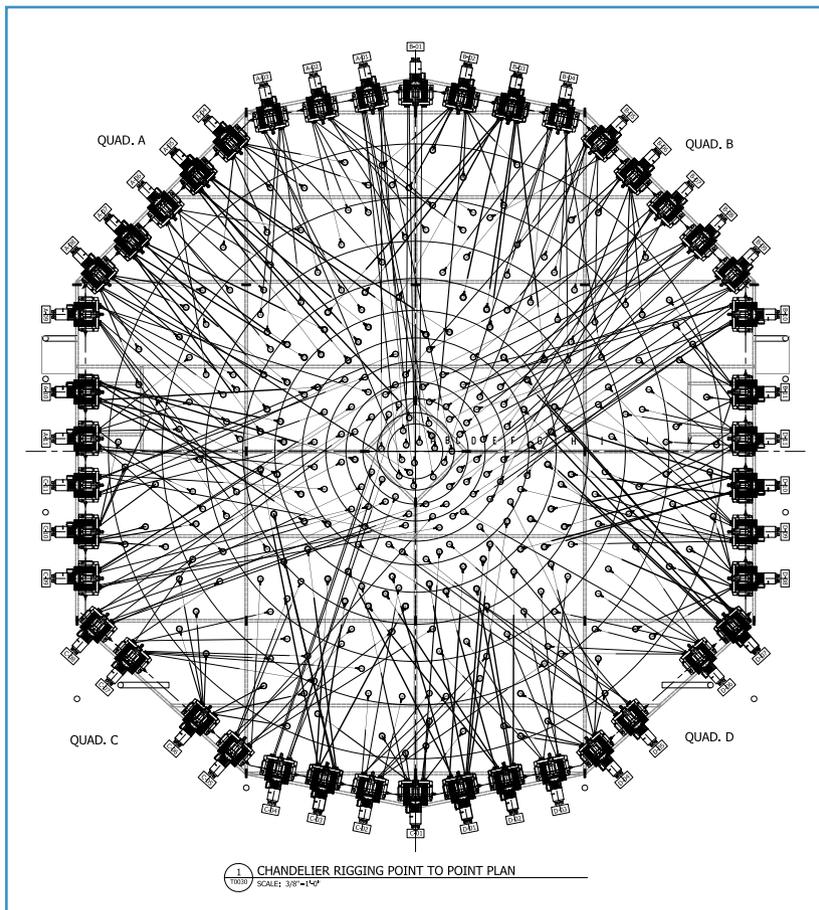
Hoist and cables grid layout. (Drawing courtesy of J.R. Clancy)
